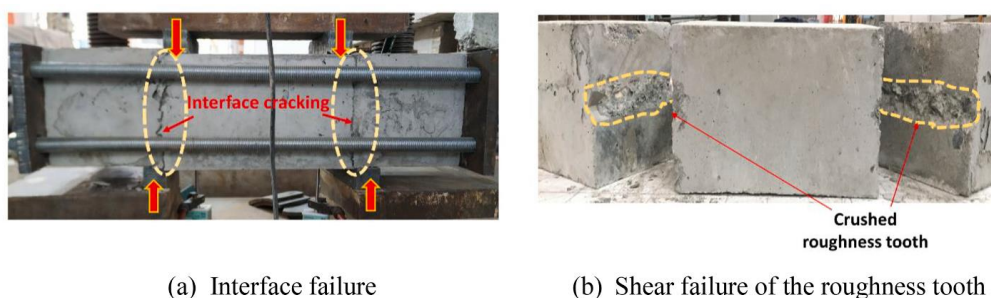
Typical Failure of Double Shear Test Specimen (Wu, Ayinde and Zhou, 2023).
